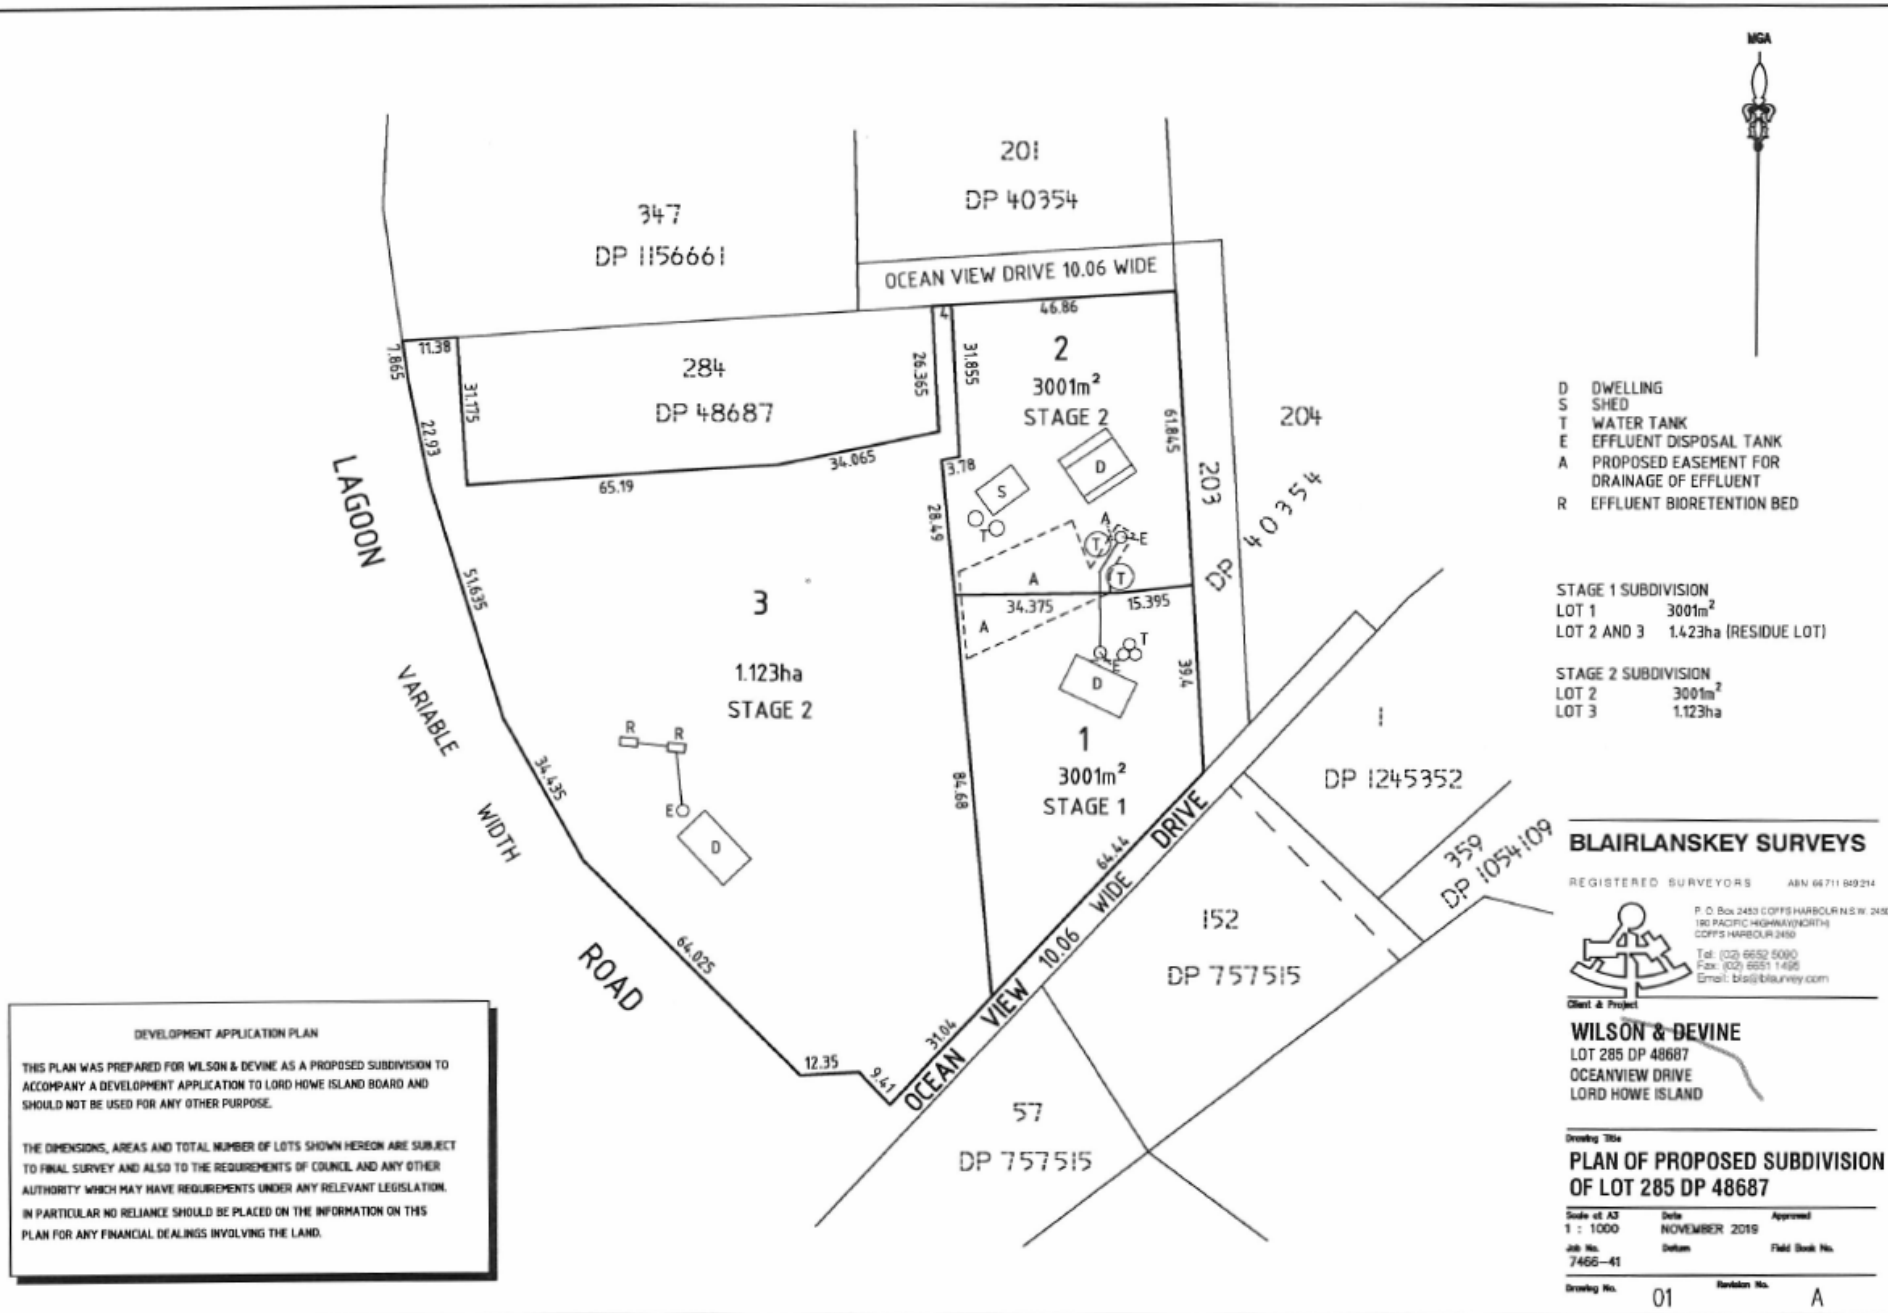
Applicant's submitted subdivision plan. Source: Blairlanskey Surveys
